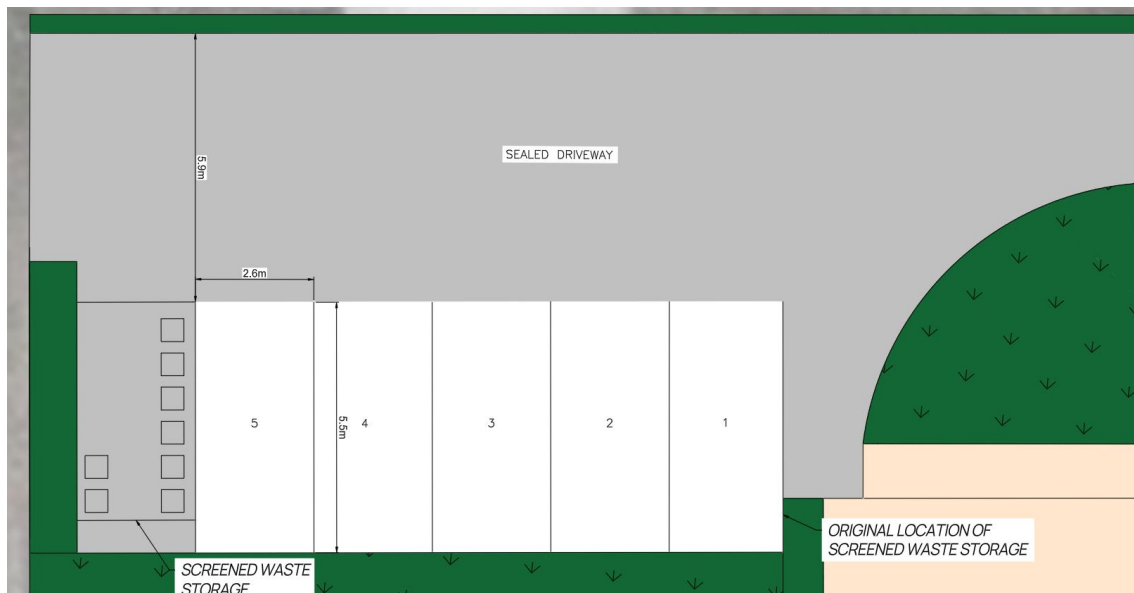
Parking Area and Internal Circulation Road Dimensions
